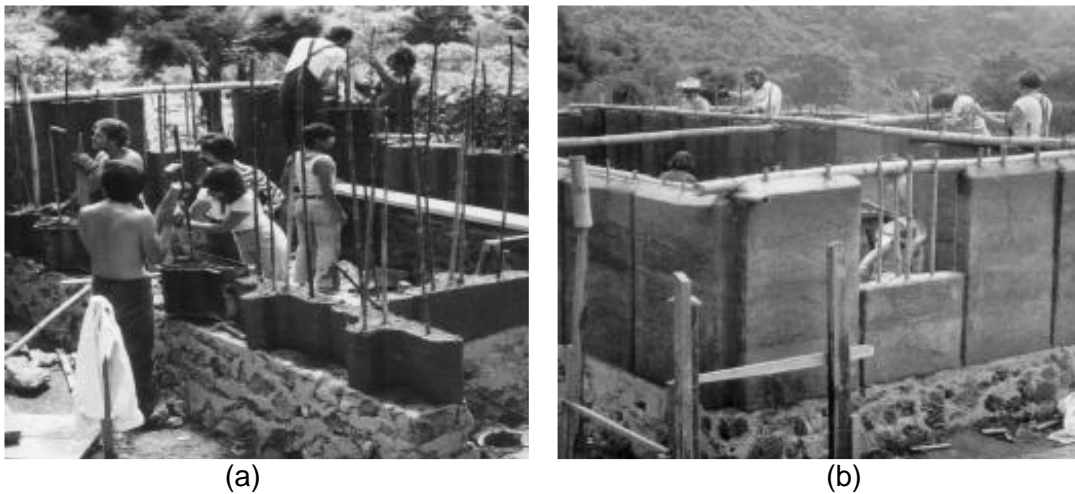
(a) 40cm high T shaped elements with 80cm length 30cm width and 14cm thick with bamboo reinforcement; (b) opening for windows (*Minke, 2001*)
